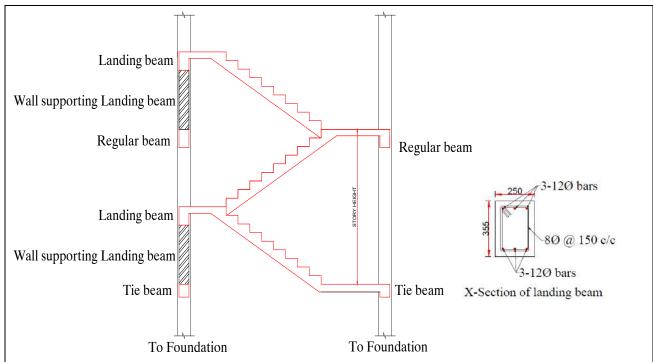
STAIRCASE LANDING BEAM ARRANGEMENT AND REINFORCEMENT DETAIL
